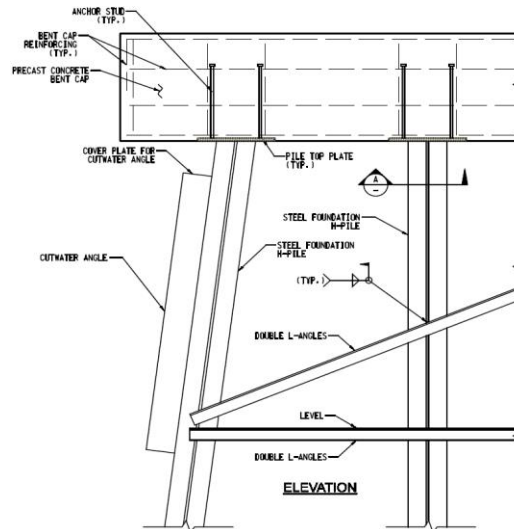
Welded connection between precast cap and steel pile
